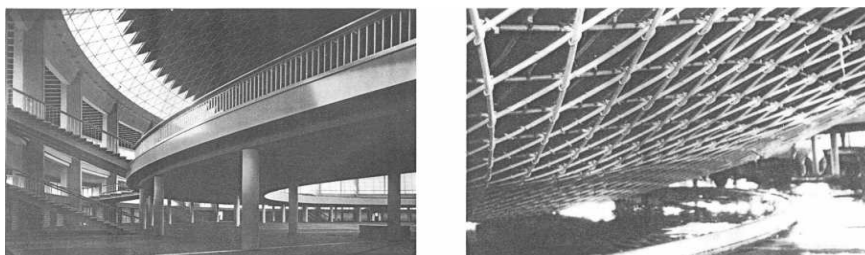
Photos of Bucharest Dome from inside, before (left) and after (right) collapse.
